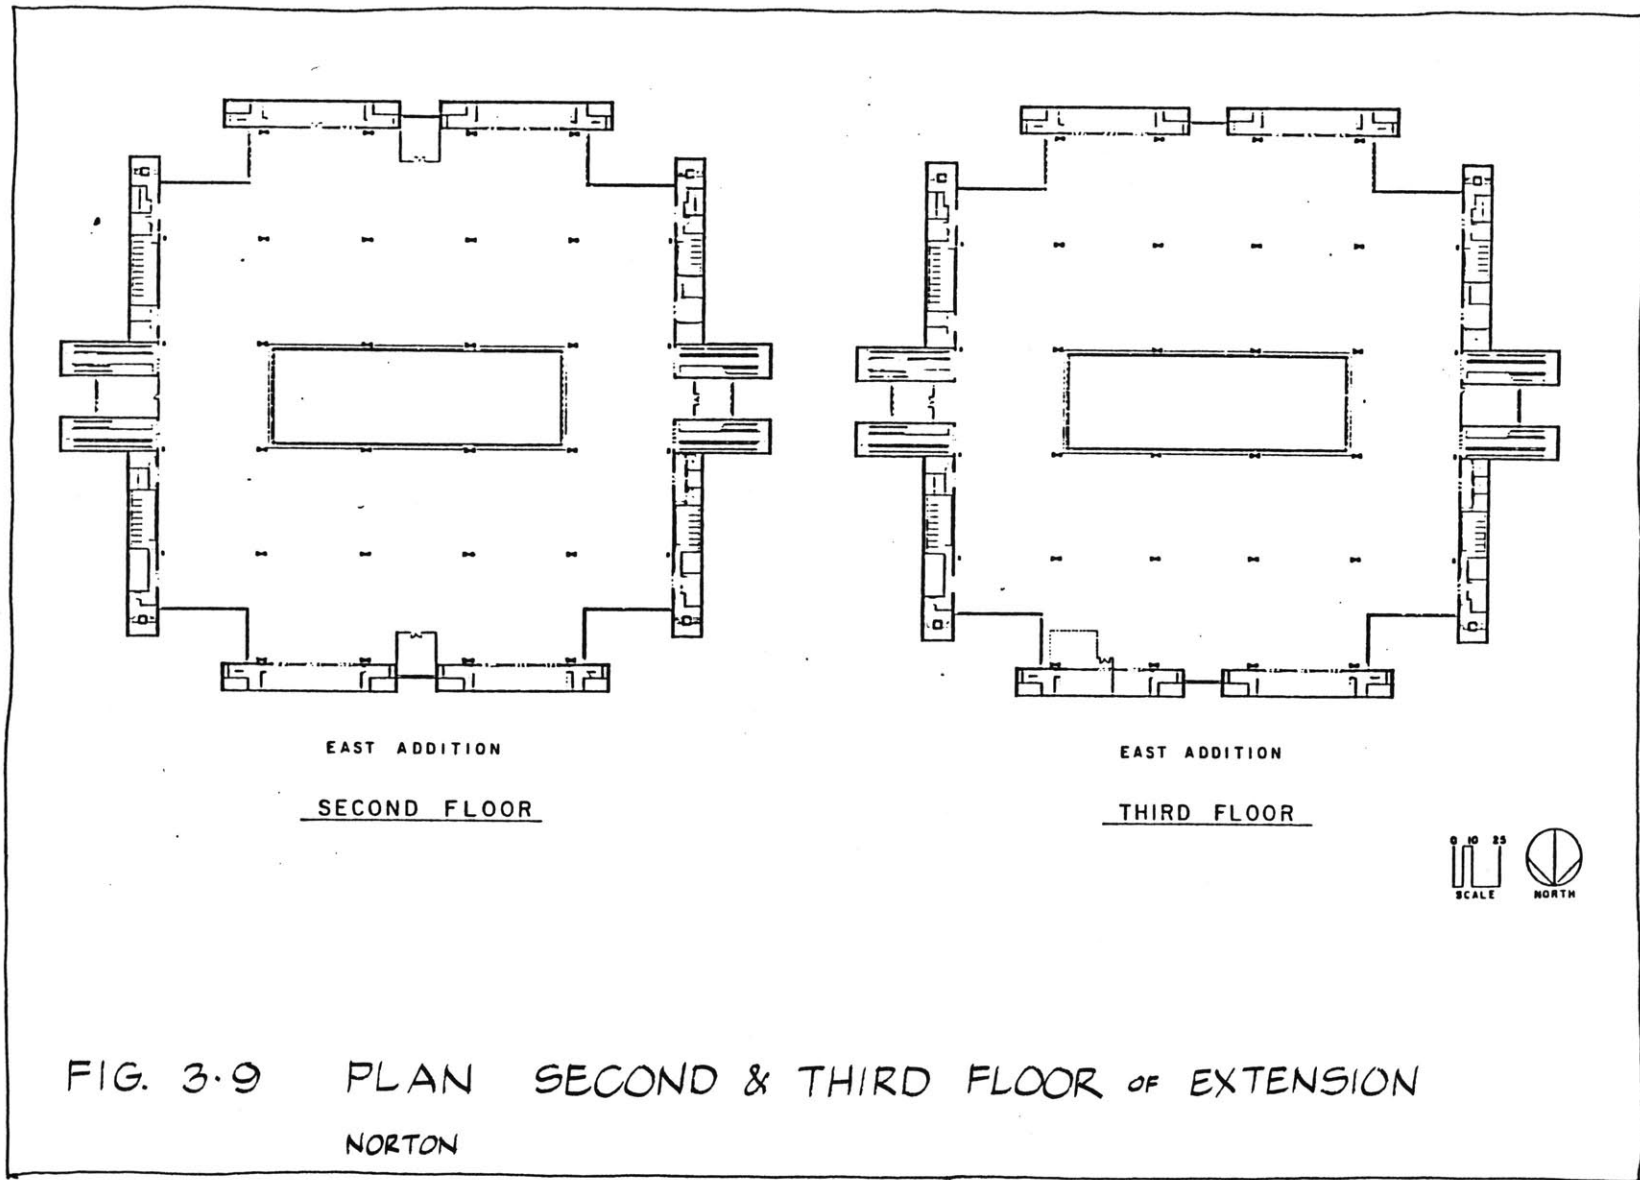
PLAN SECOND & THIRD FLOOR OF EXTENSION
